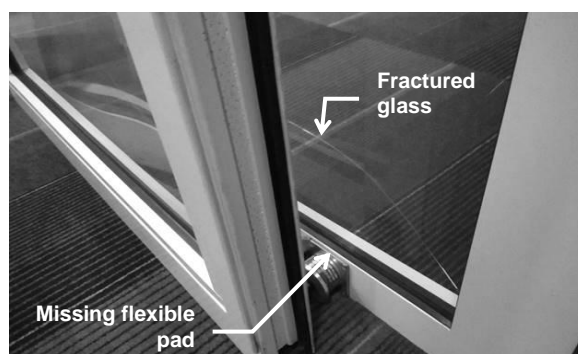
Example of an installation error – the door guard is rigidly fixed to the frame of the adjacent glass wall
